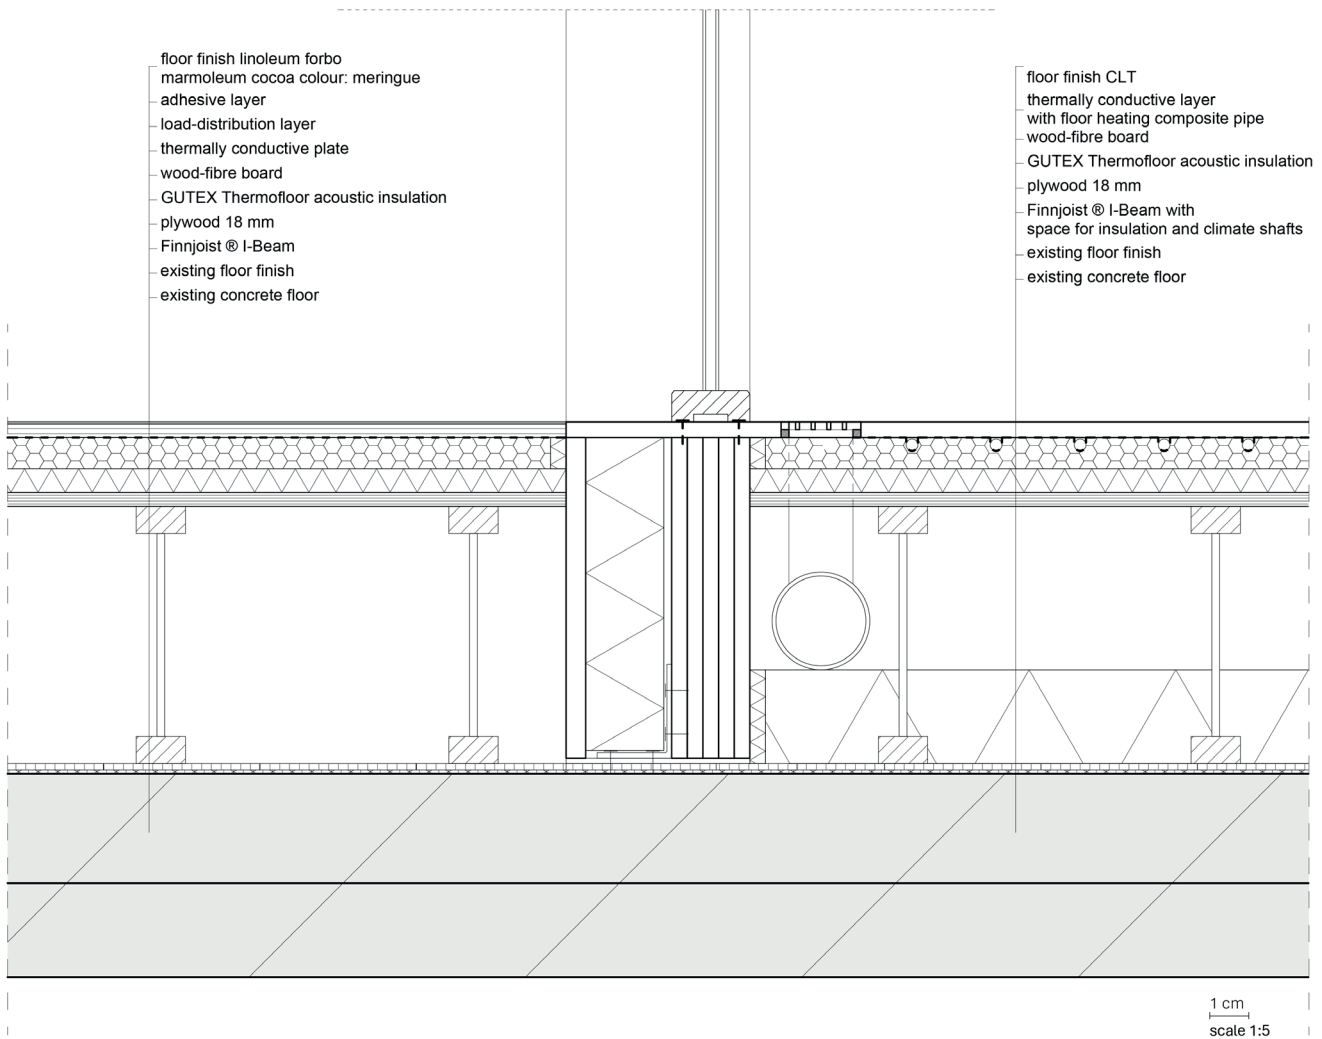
Detail C 1.10 of box-in-box detail of newly added structures in existing building
